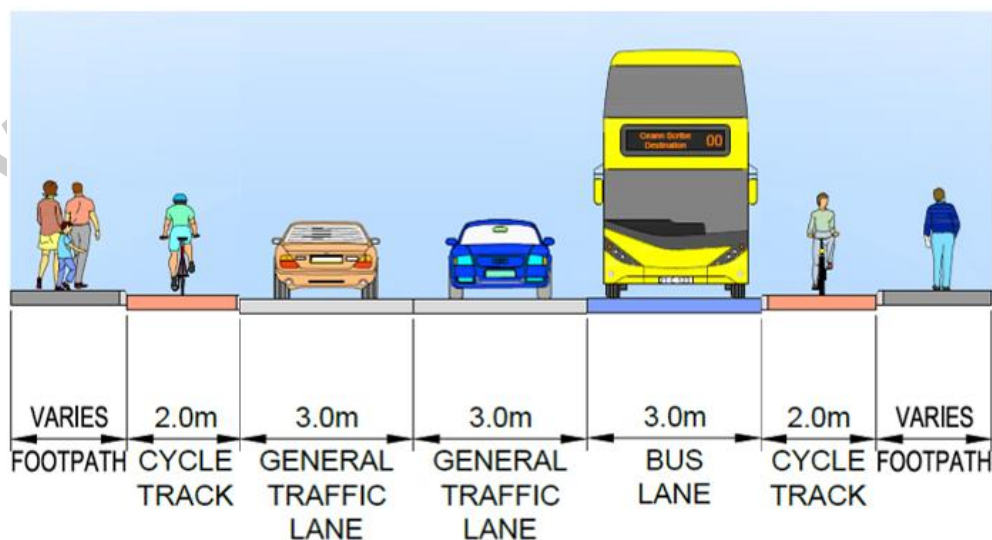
Section 2C, Proposed Option 1a/1b – Cross Section B-B
